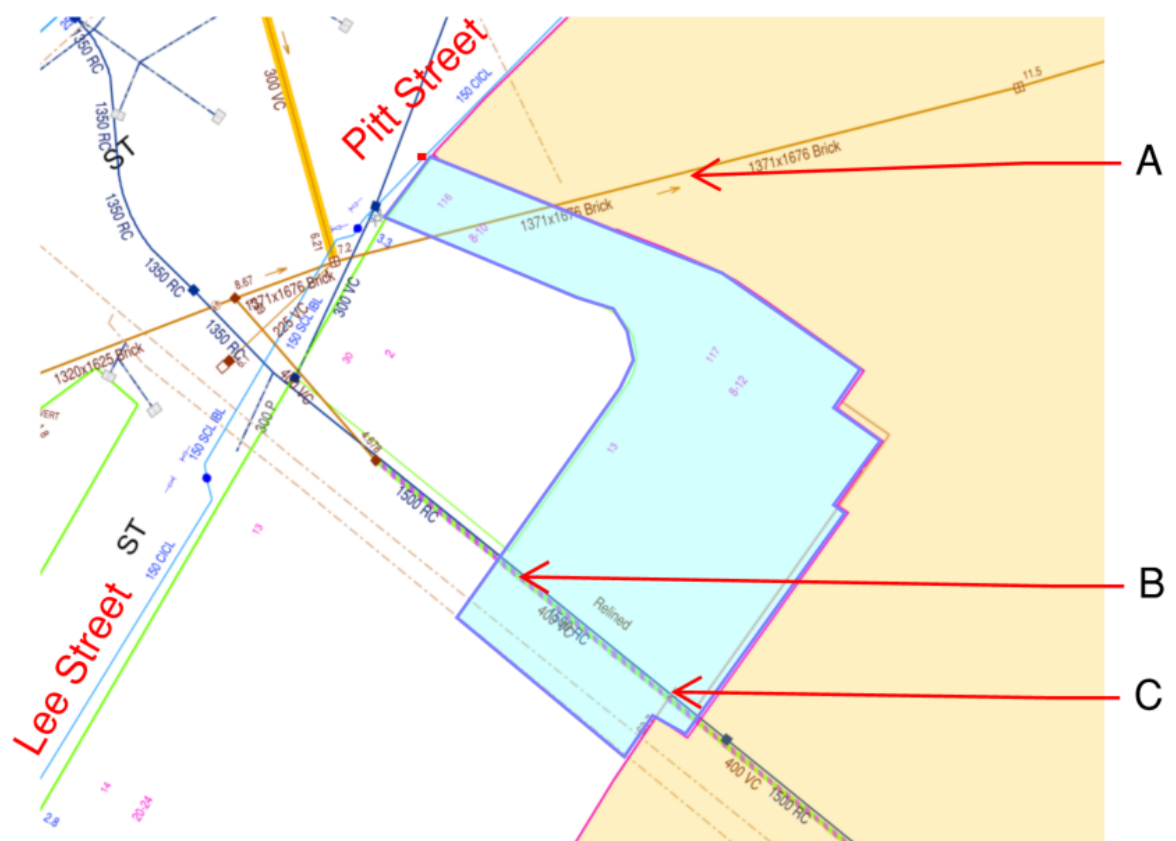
Existing Sewer(A, C) and Stormwater (B) Mains Connection
